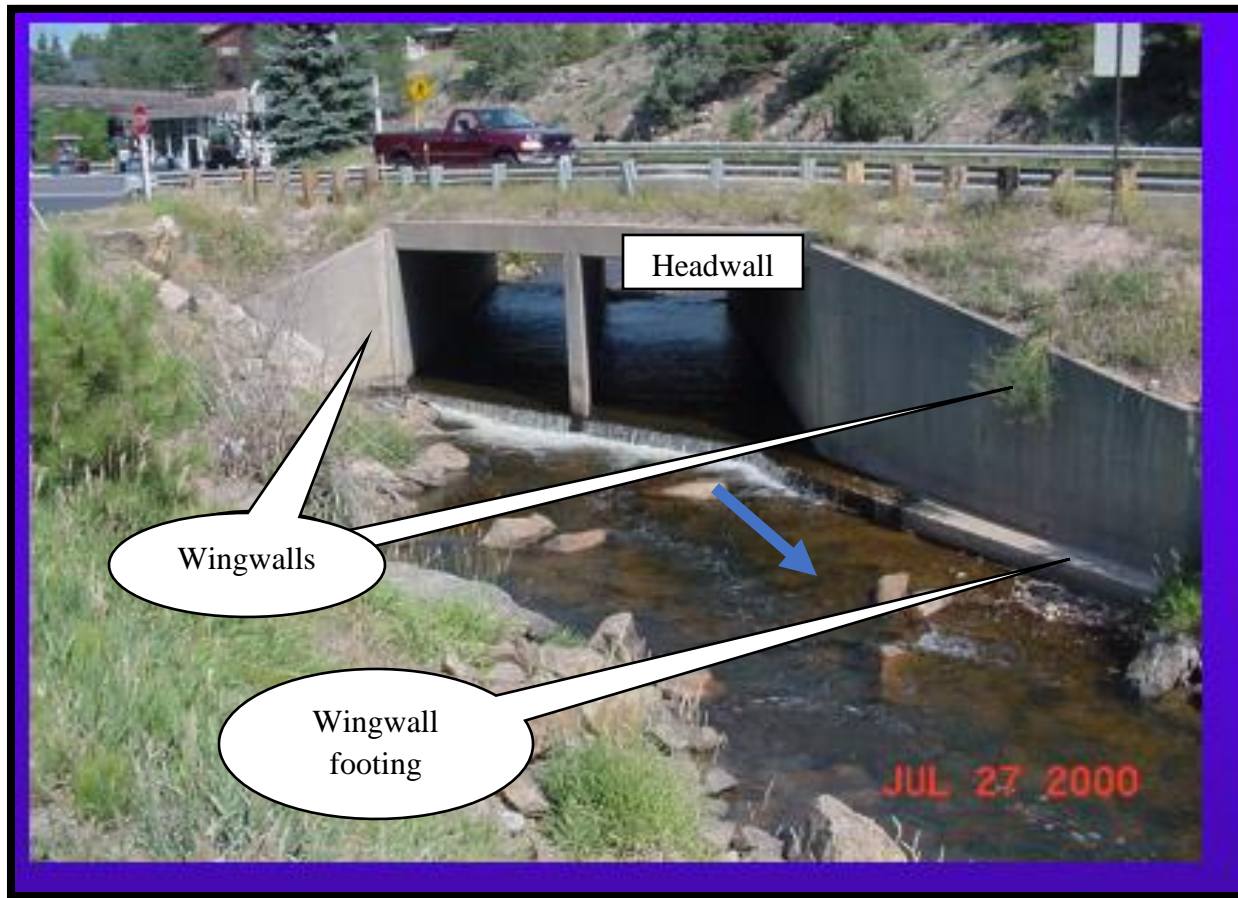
A double skewed concrete box culvert at Bear Creek, CO, USA, 07/27/, 2000. ¹
